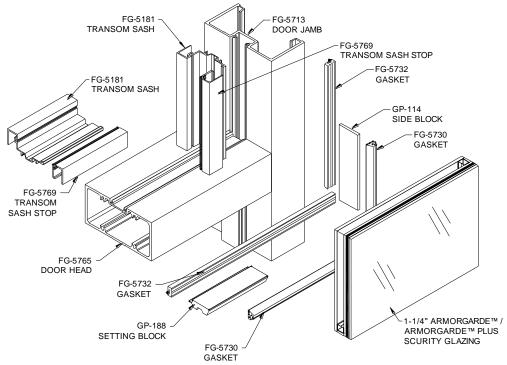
ArmorDefend™ Plus Dry Glaze Assembly at Transom for FG-5765 Door Head
